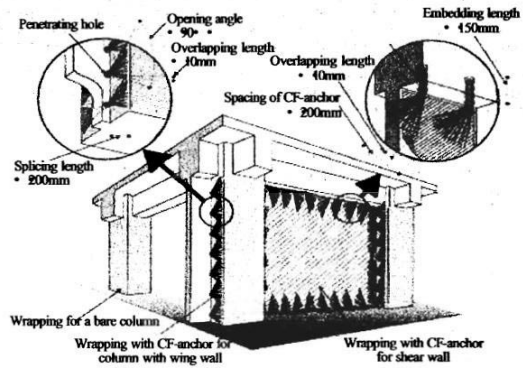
Variety of Structural Elements and applications of CF-anchor
